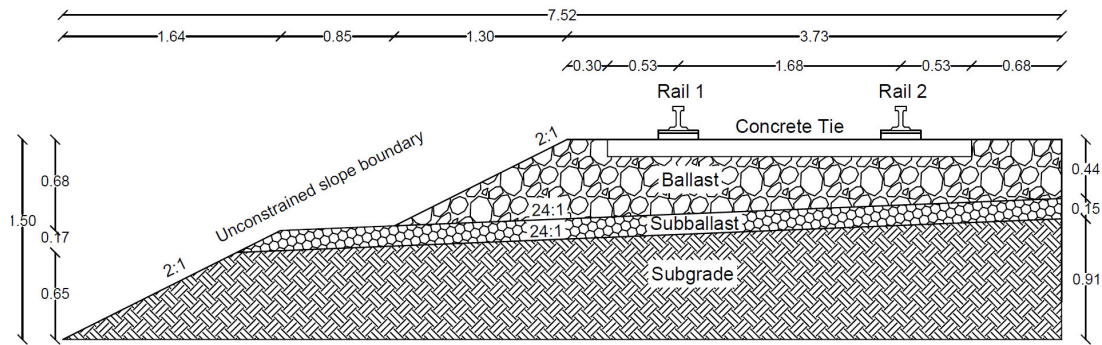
Specimen configuration selected for the full-scale rail embankment tests.
